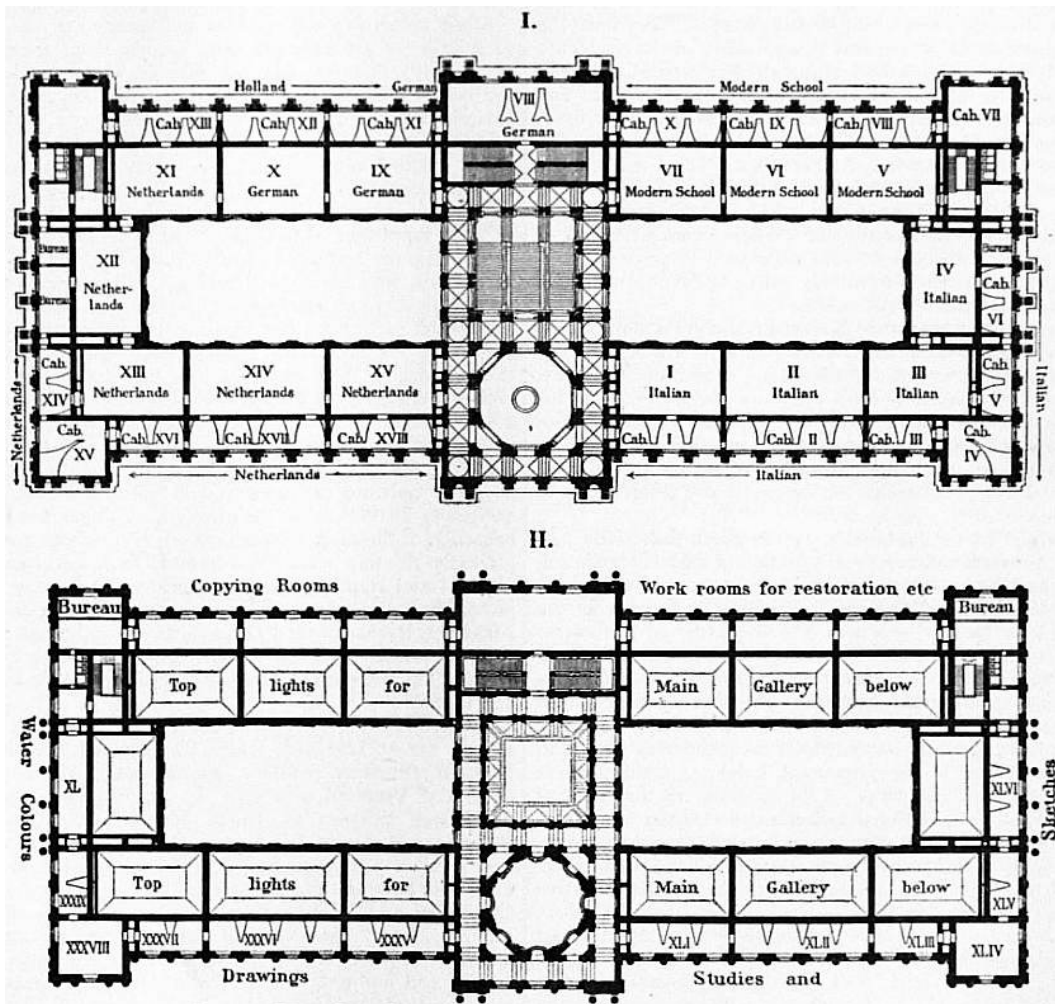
Plan of the first and second floors of the Imperial Gallery, Vienna.
